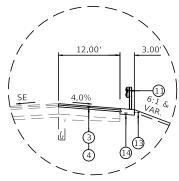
+01.25 TO STA. 1155+48.60
